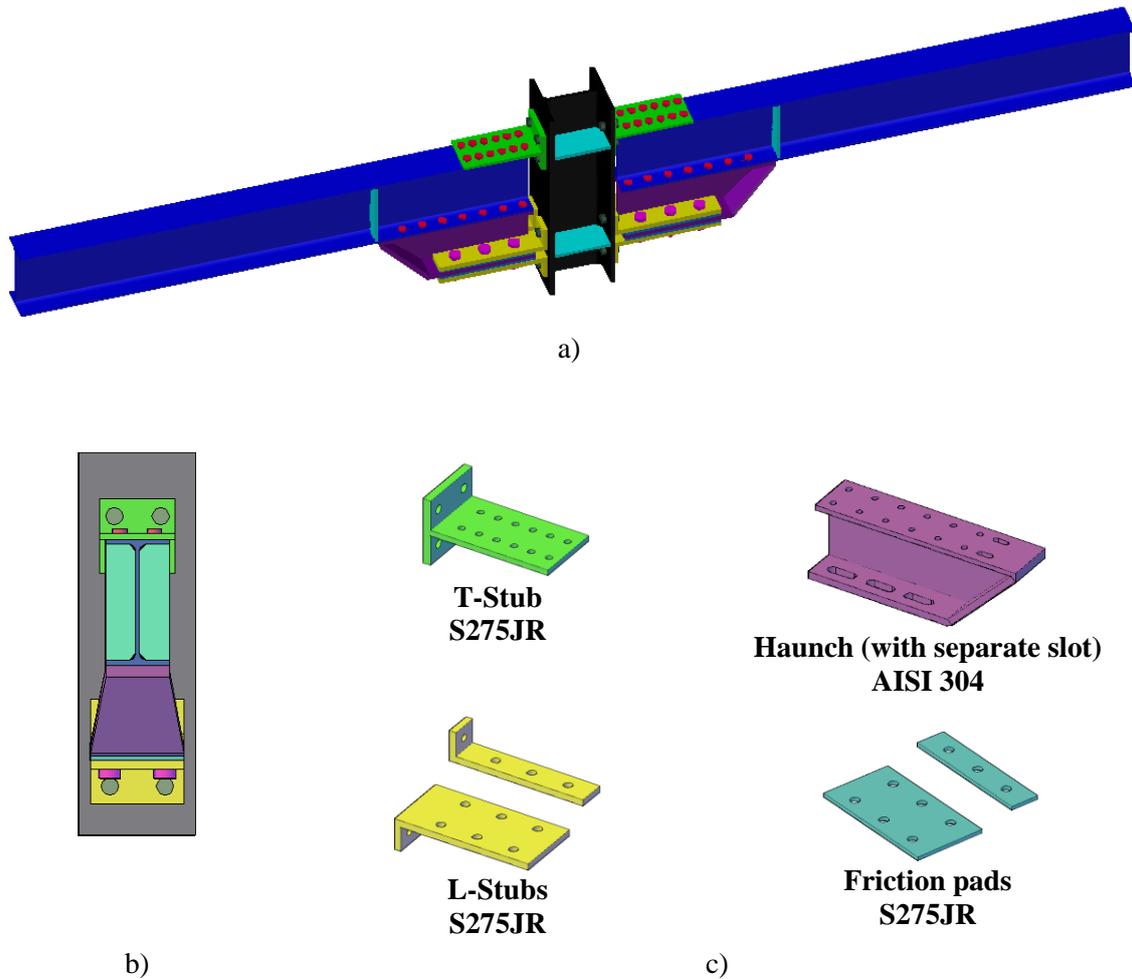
a) Tested layout ; b) Lateral view; c) Joint details, from [9]
